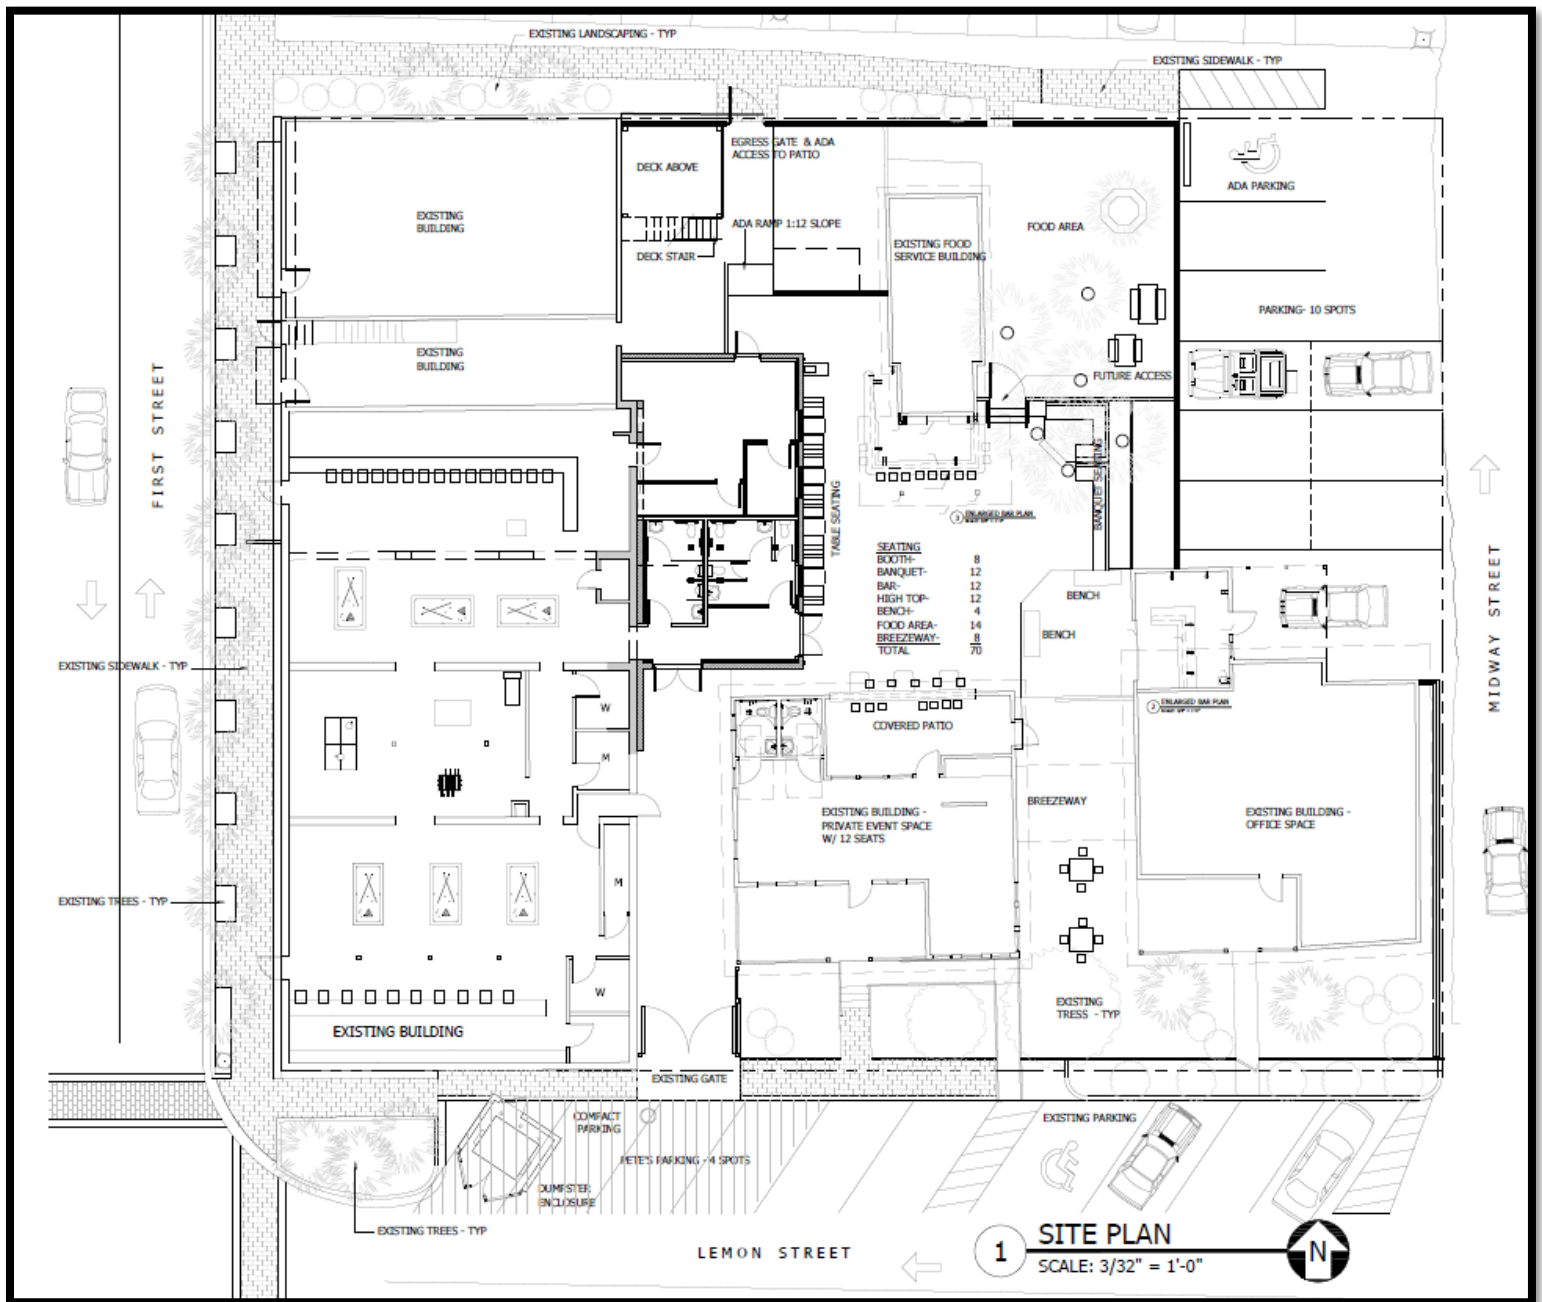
DP24-05 Pete's Bar Modified Development Plan
